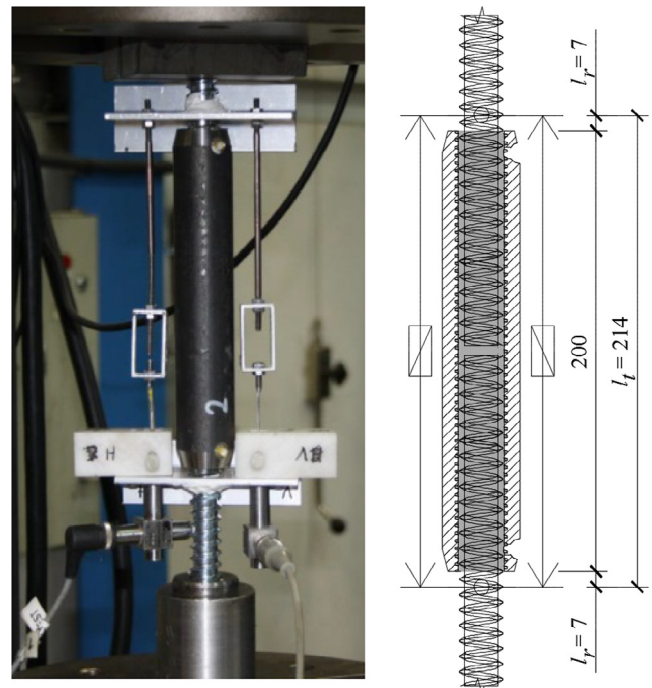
Test set-up of tensile test of the rod splice (dimensions given in mm).
